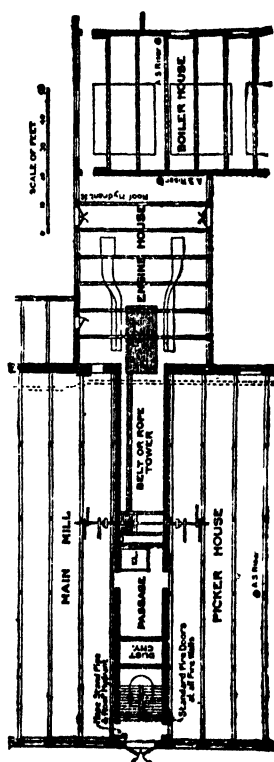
Plan of Tower for Elevators, Stairs and Belts
